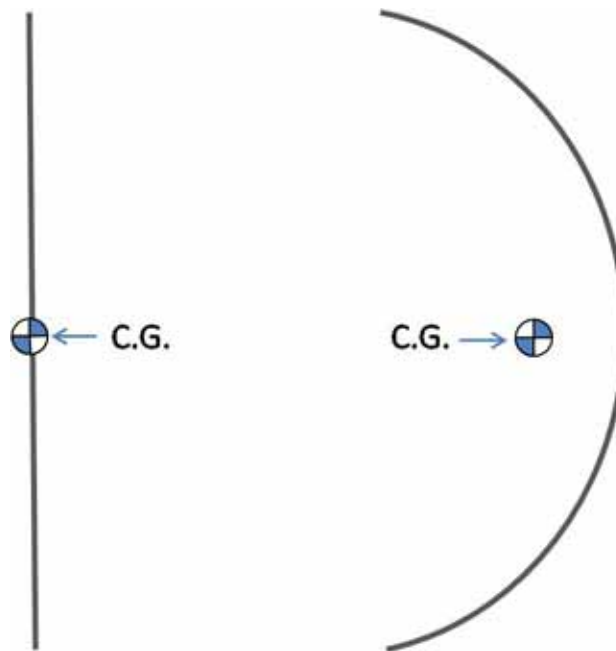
Plan View Schematic of Curved and Straight Girder Center of Gravity (Schuh 2008)
